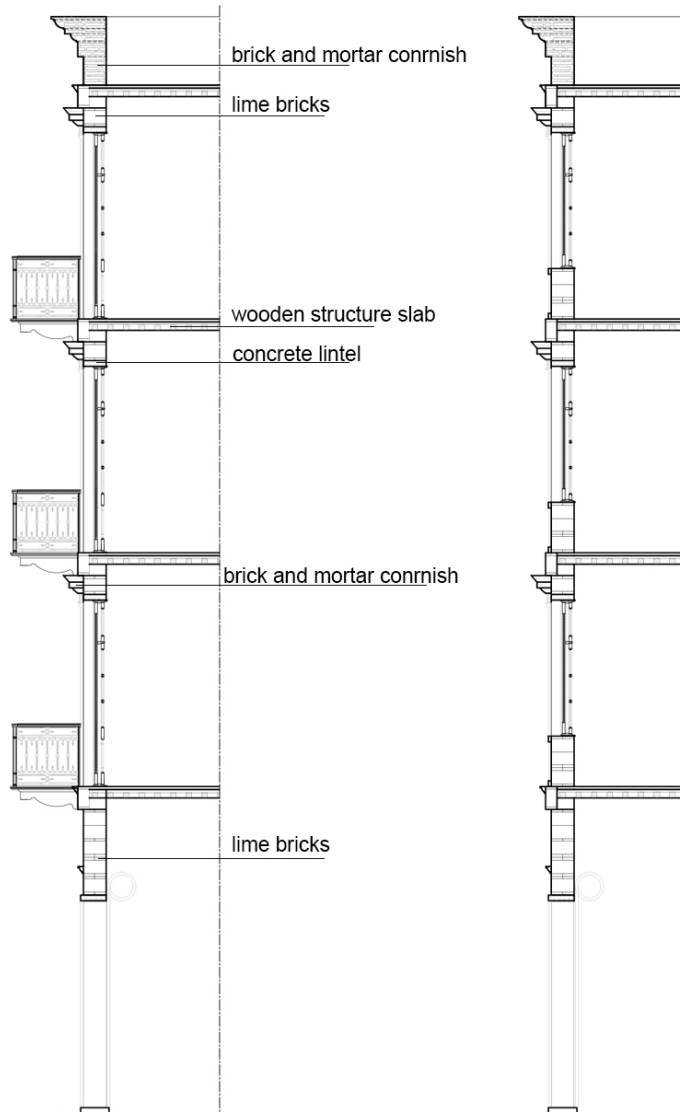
strip sections through the building external facade demonstrating the structure system and materials, source: the researcher
